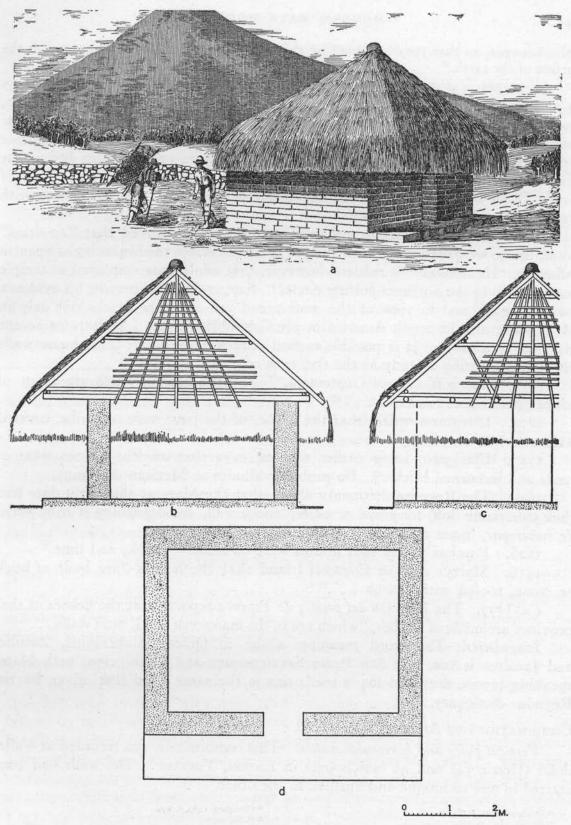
HOUSE 1, SAN PEDRO DE LAGUNA, GUATEMALA (Square plan, pyramidal roof, adobe-brick masonry walls, porch, walls supporting roof framing)
